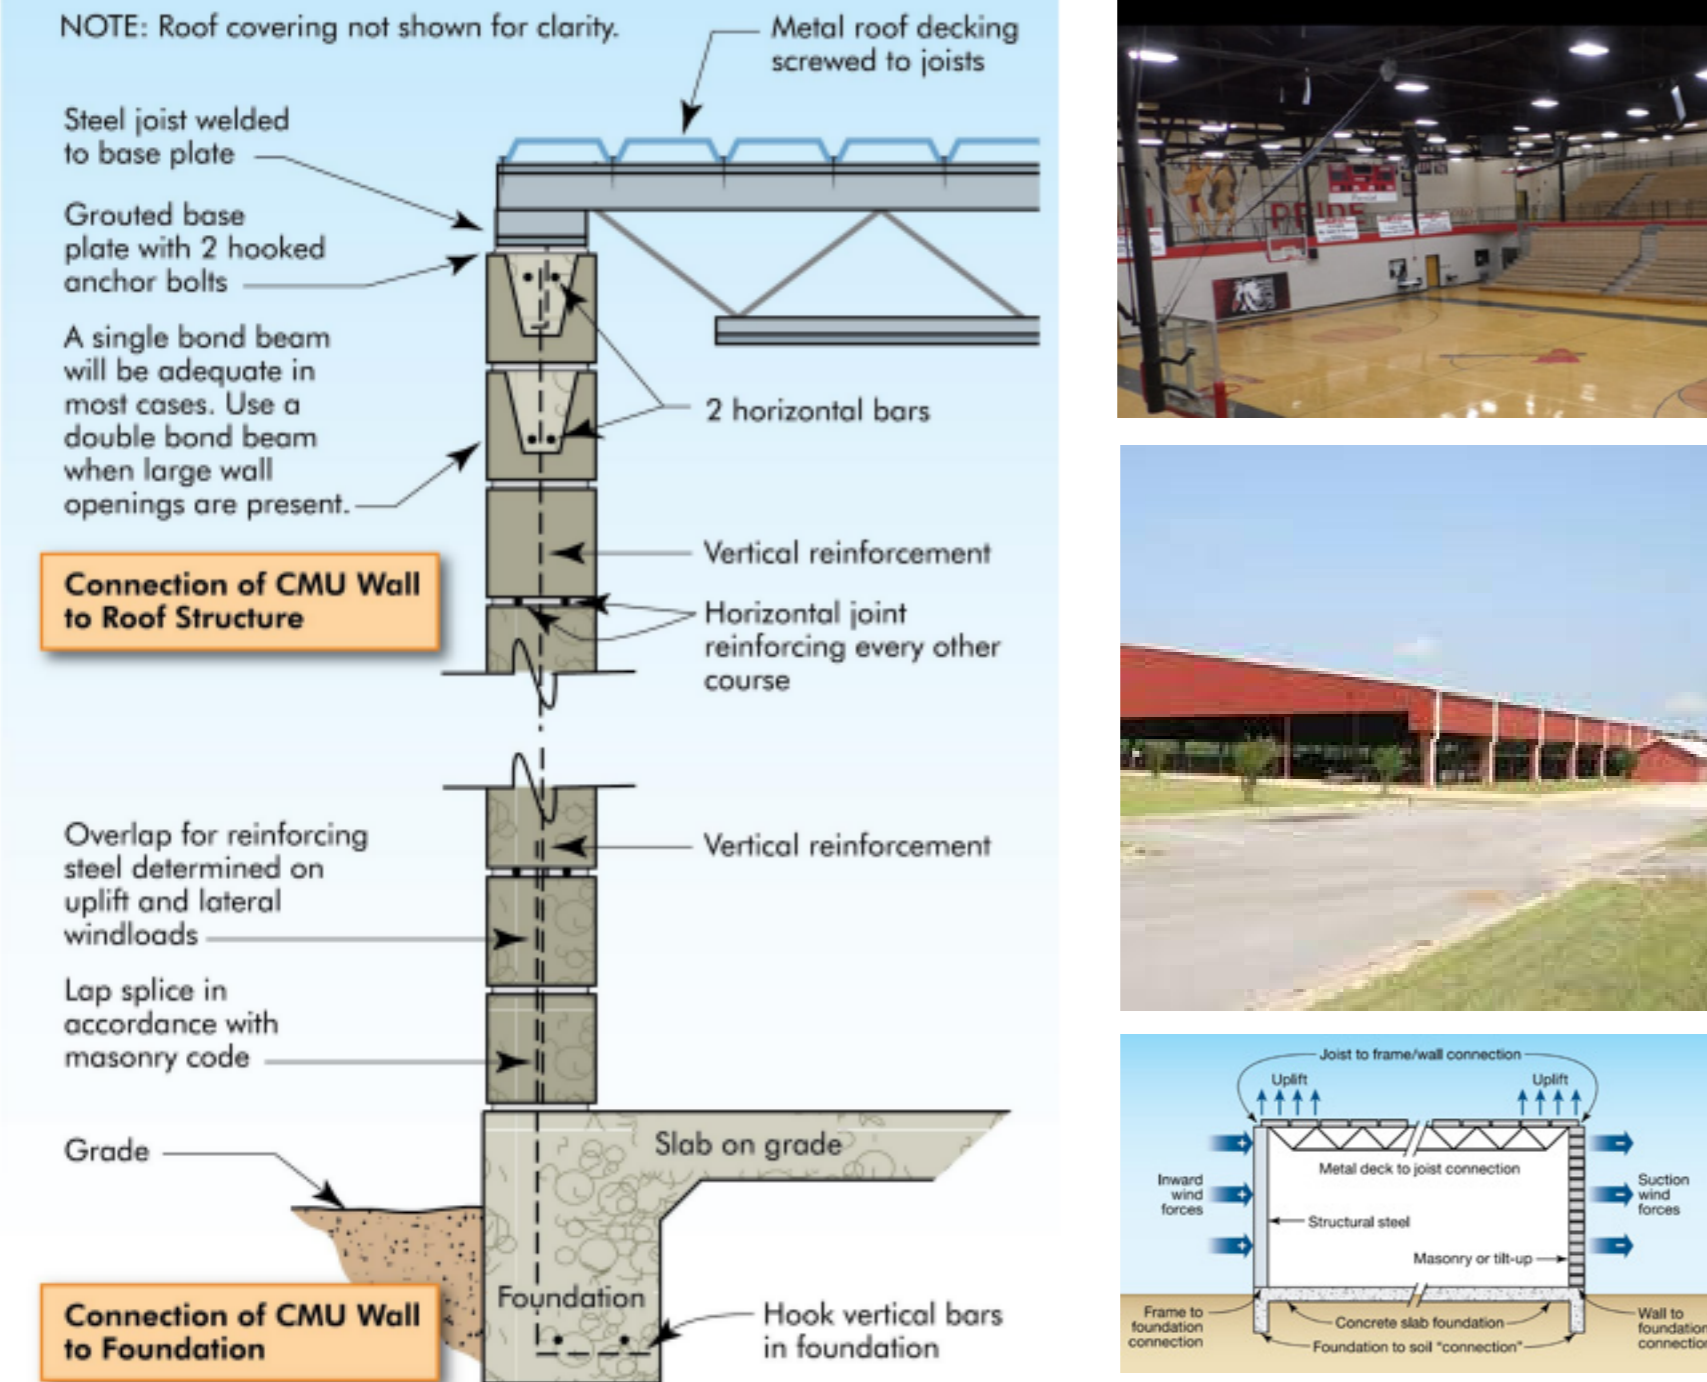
Example of a masonry wall detail, incorporating many construction best practices
